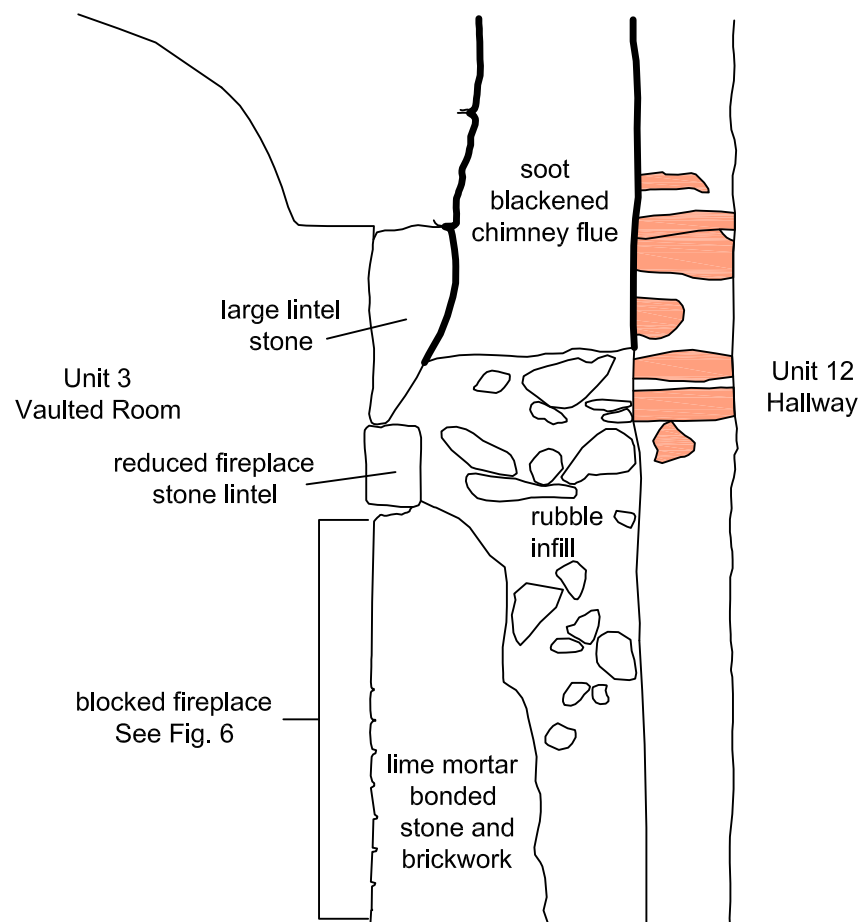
A East-facing elevation of new slapped doorway between units 12&3
